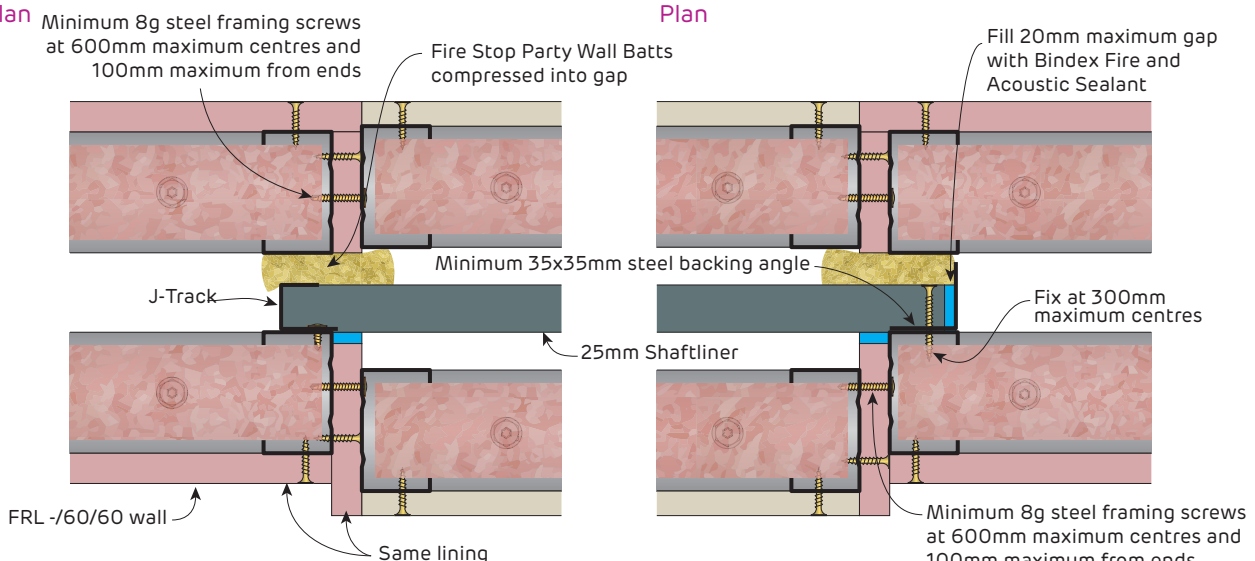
InterHome High-Rise Wall Transition to Double Stud Fire Rated Plasterboard Wall
